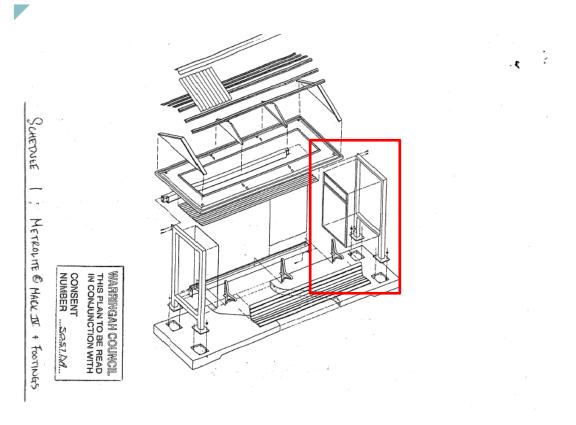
Shelter J1 DA5051 Stamped Plan indicating advertising panel (outlined red)
